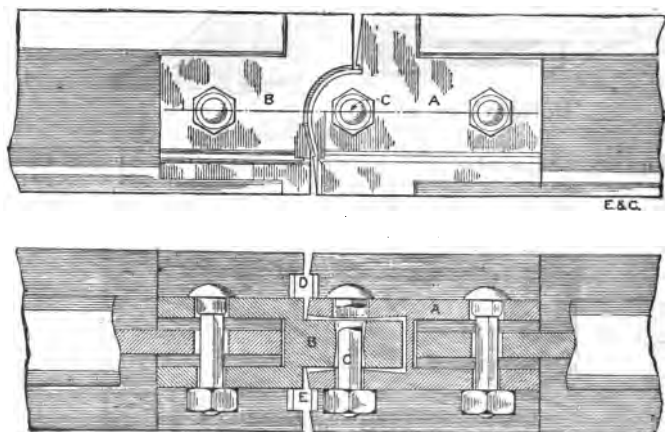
Side Elevation and Horizontal Section of Thull Rail Joint.
